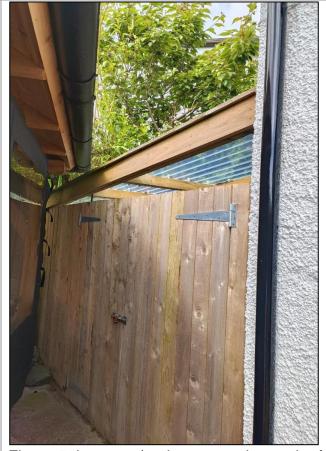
Luggage/cycle store to the north of the existing outbuilding
